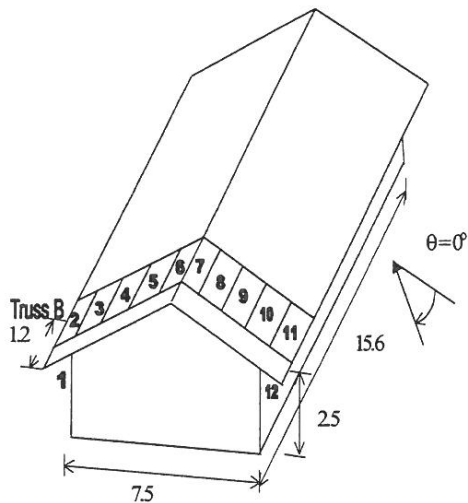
7.5 × 15.6 × 2.5 m 20° roof pitch low-set building tested at 1/50 in the CSTS wind tunnel.
